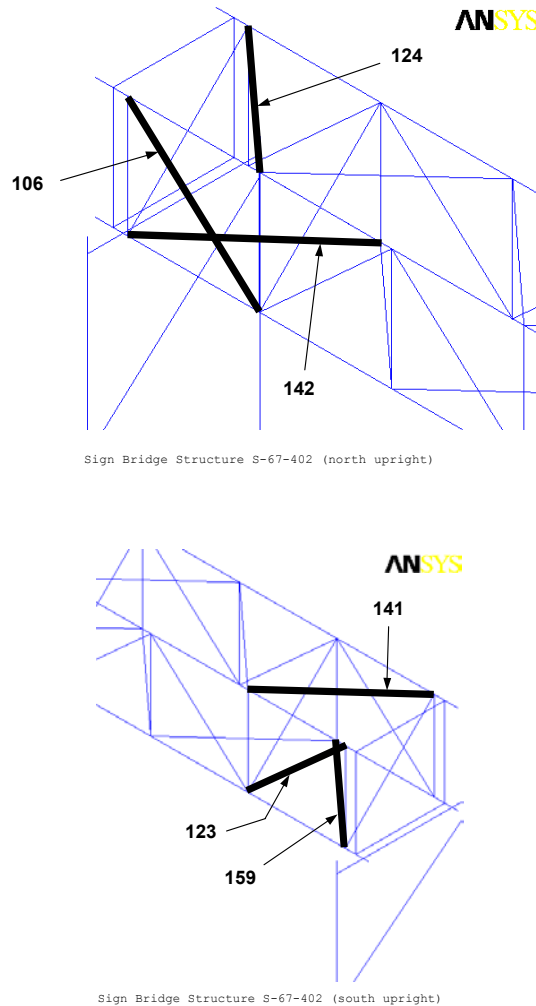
Critical Overhead Truss Web Members of Sign Bridge S-67-402 (Ginal 2003).
